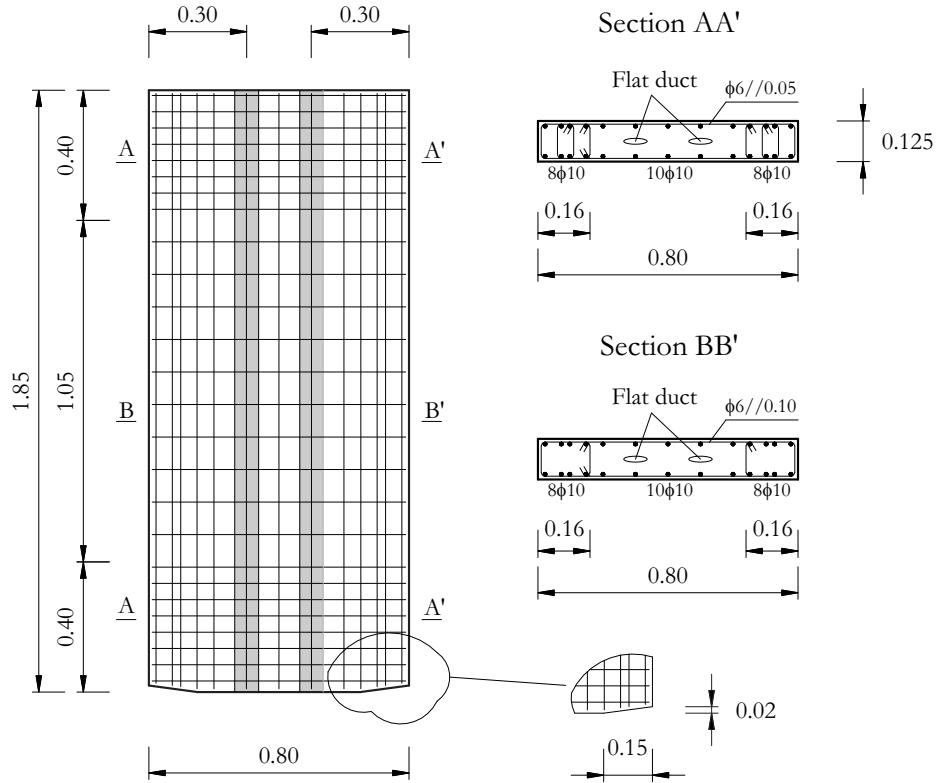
Reinforcement details of the specimen RM3 wall.
